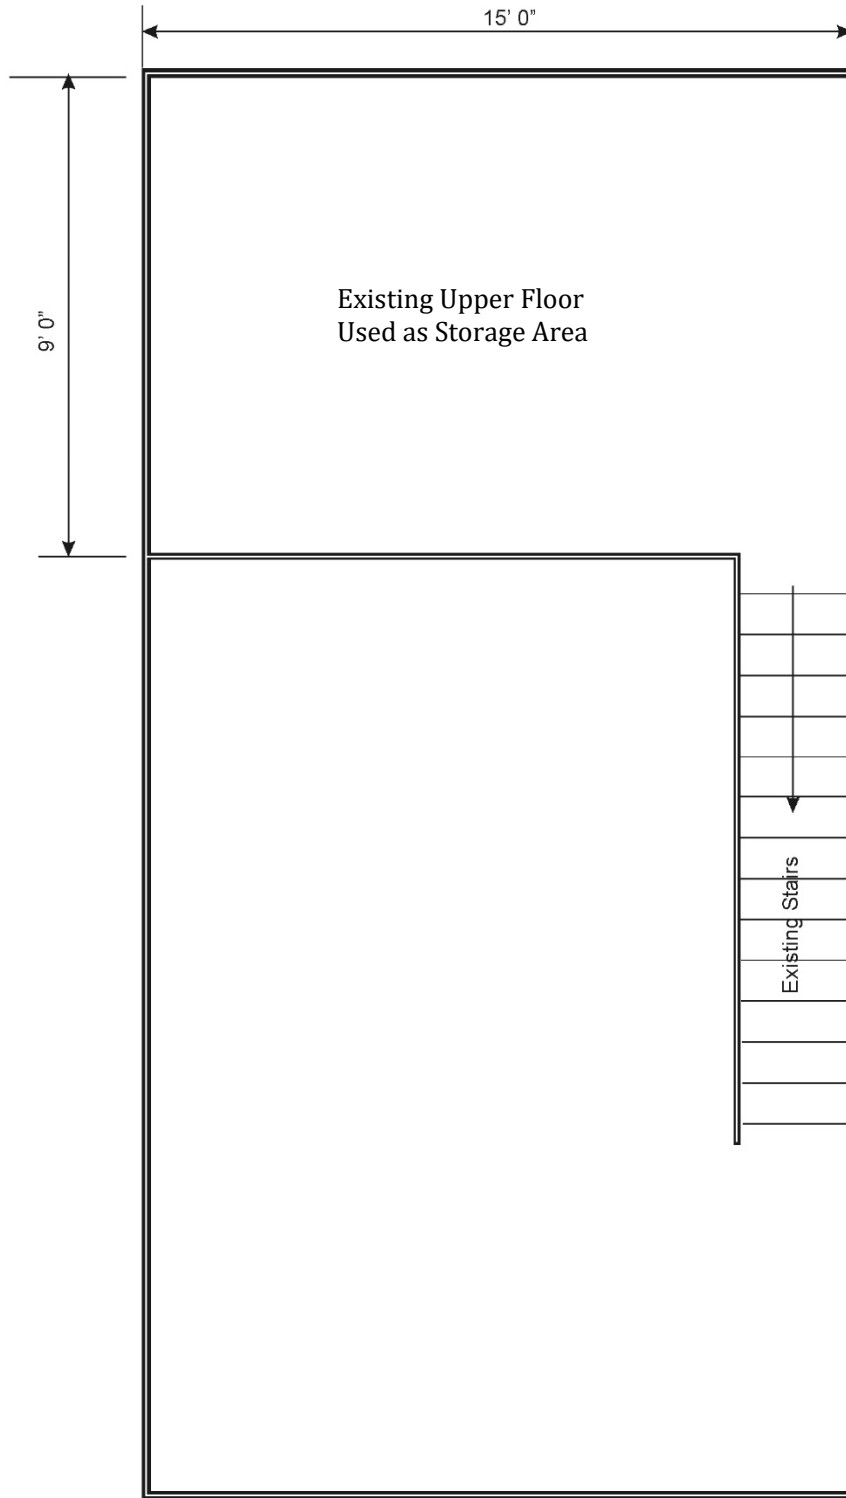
Upper Floor Plan (to be 1/4" = 1'-0")
